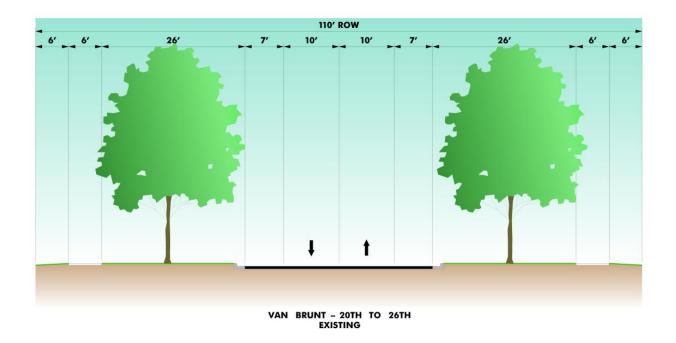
Enhanced Streetcar Truman Road Alignment Typical Section - Van Brunt 20th-26th Streets Existing Conditions
